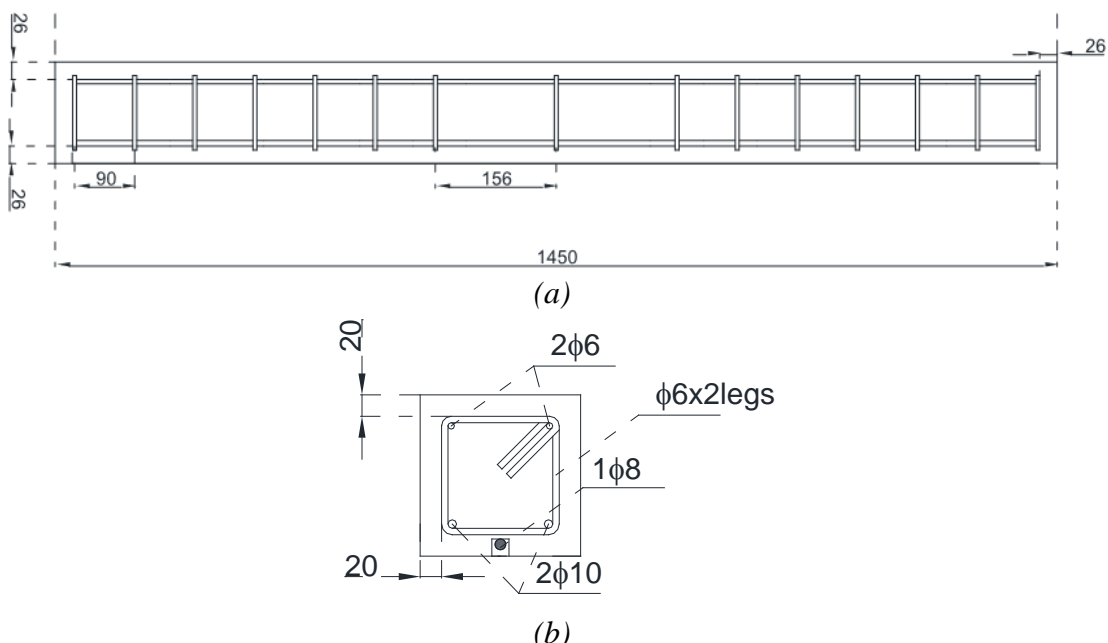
NSM FRP strengthened RC beam (a) Longitudinal section, (b) Cross section.
